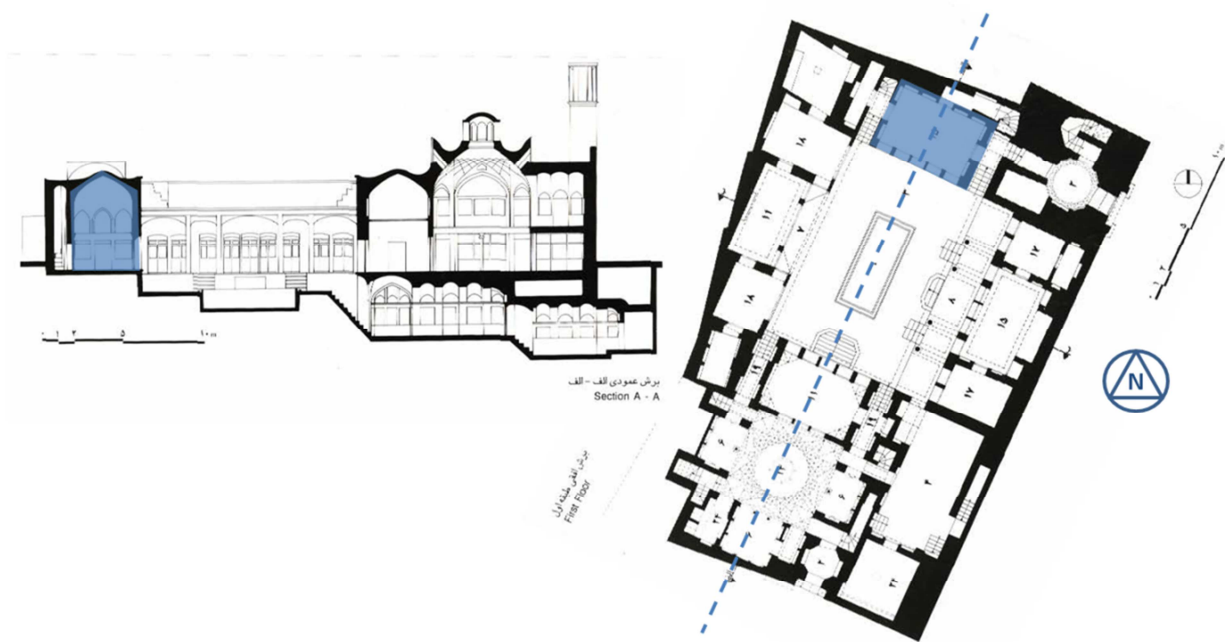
The location of winter living room in plan and section marked in blue, Jahan-ara'I house, Kashan, Iran. Retrieved from Haji-Qassemi (1996) and edited by author.
